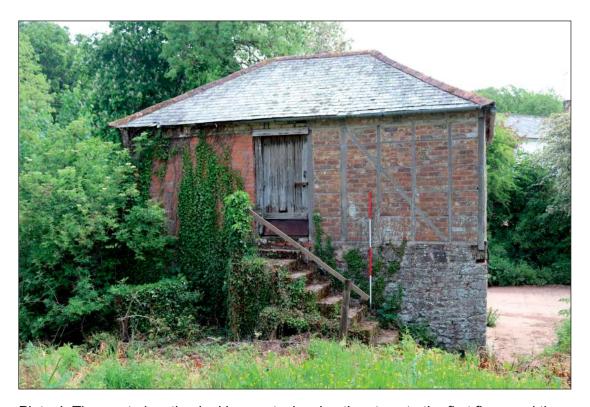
The west elevation looking east, showing the steps to the first floor, and the replacement brickwork and timber framing (2m scale)
